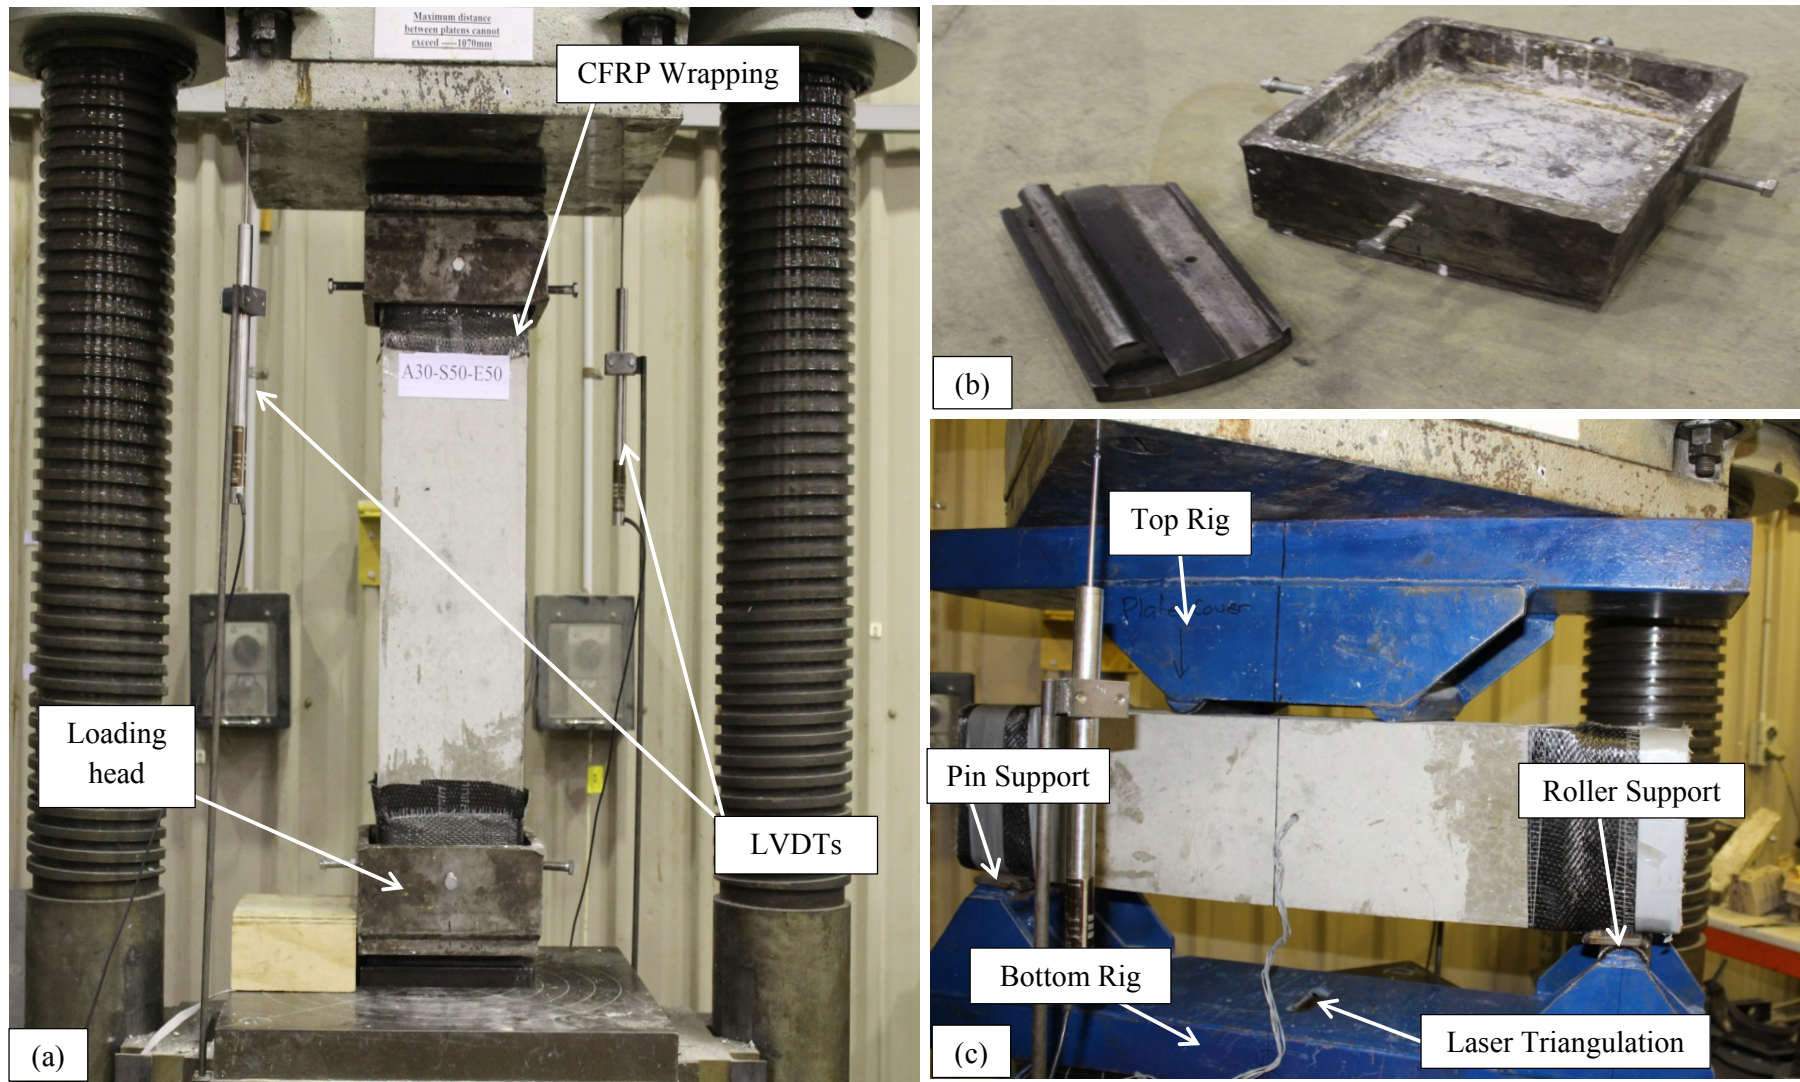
Typical testing setup: (a) Specimen under axial compression; (b) Loading head and eccentric load system; (c) Specimen under four-point loading
